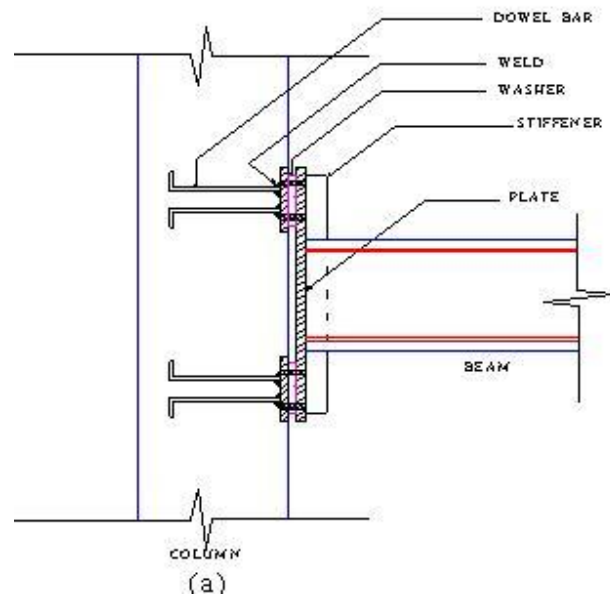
Connection with stiffener between precast reinforced concrete beam and cast-in-situ column in prefabricated building frames.
